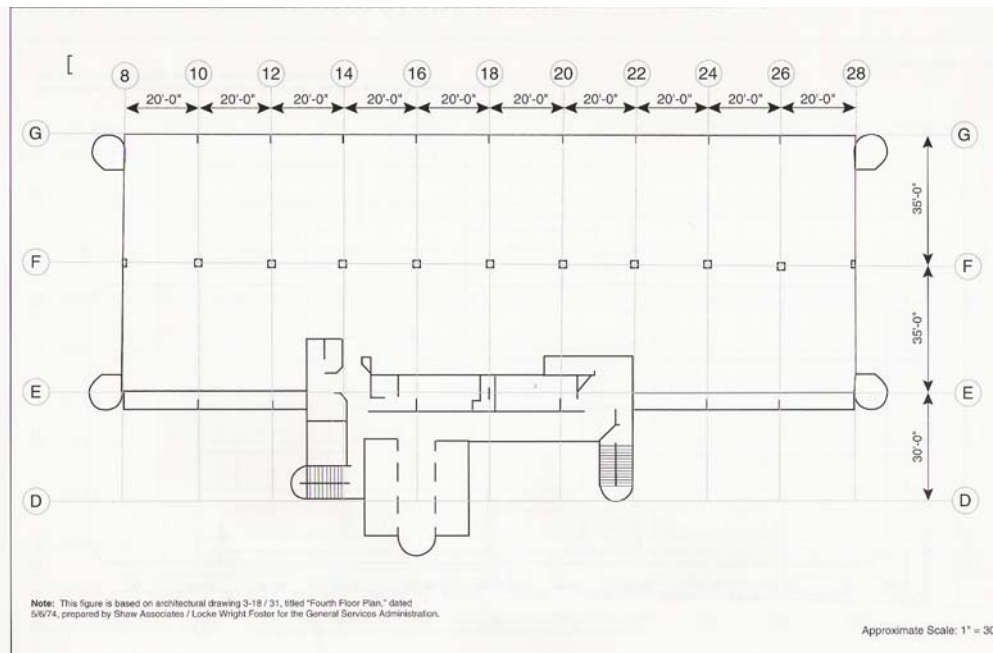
Fourth Thru Ninth Floor Plan Of Murrah Building (FEMA 1996)
